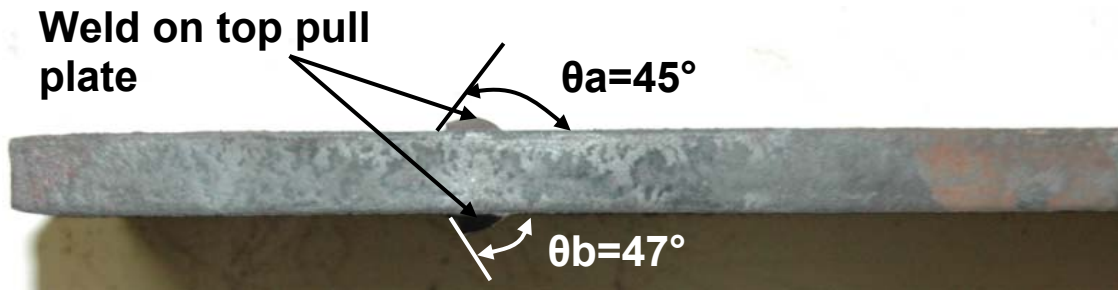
Photograph of a side view Specimen P1, where the profile of the fractured weld on the top pull plate is visible
